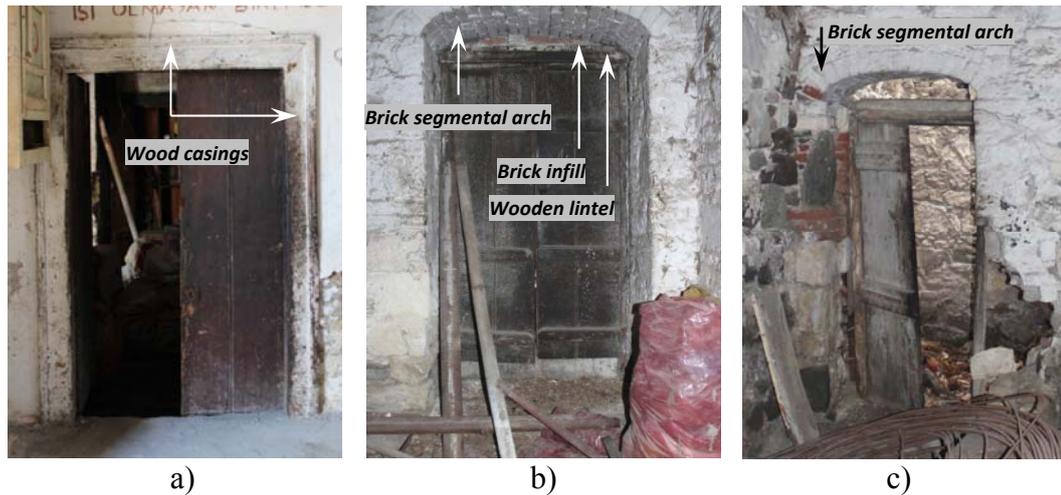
a) The front view of wooden batten door (G-01), b) the rear view of the same door, c) batten door between machinery room (G-07) and water tank space (G-06)
